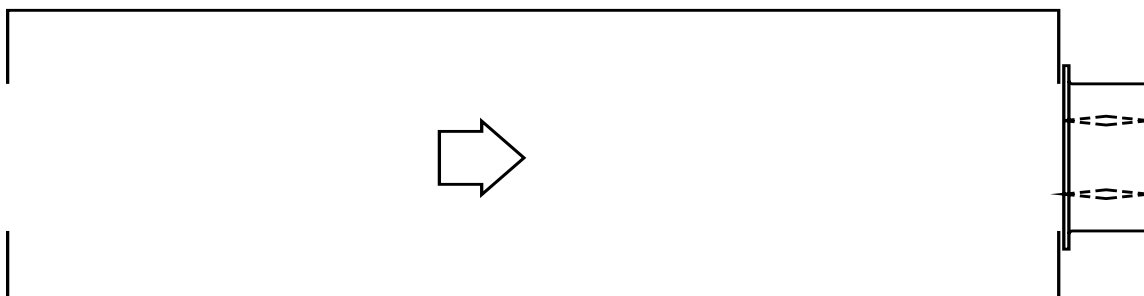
Illustrates a fully ducted damper. This configuration has the lowest pressure drop of the three test configurations because entrance and exit losses are minimized by straight duct runs upstream and downstream of the damper.
